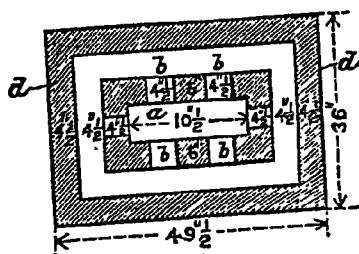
is a vertical section of the chimney top, shown in elevation in Fig. 138 and in cross-section in Fig. 139. a, a is the brick-work (inside view of the flue) in elevation; d, d is the brick-work of the chimney in section; b, b are openings leading from the inside of the flue into the open trough, by which the smoke escapes; pipes to take off the rain which falls into the open trough are added; a stone slab 2 inches thick which is placed (not set in mortar) over the top of the flue, and prevents rain beating down the chimney.
